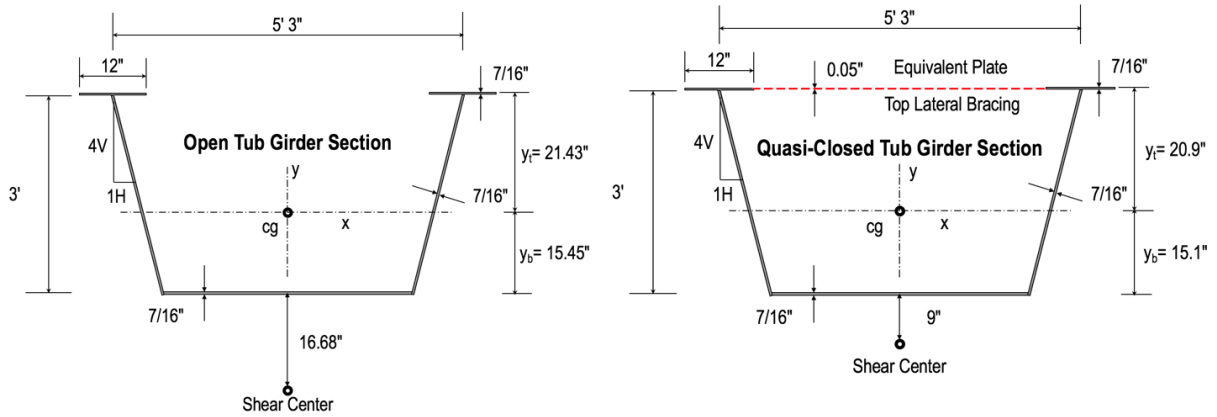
84ft. Steel Tub Girder Model 1 Cross Section and Shear Center Location
